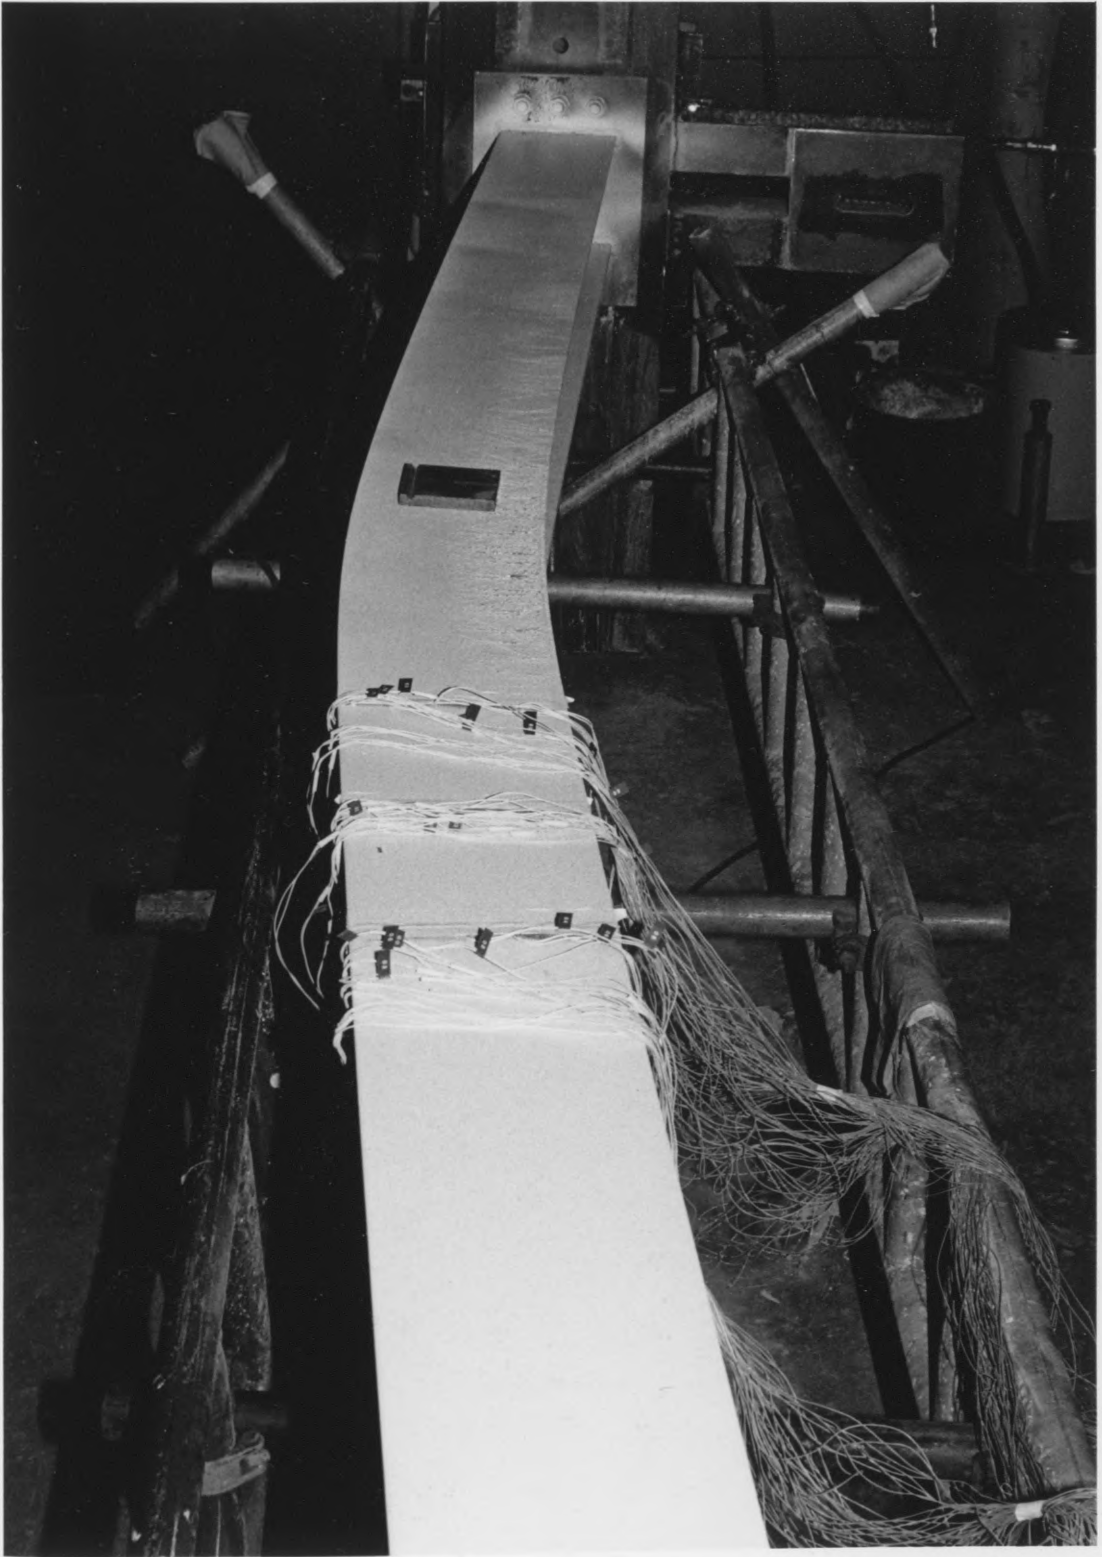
TYPICAL DEFLECTED SHAPE AT FAILURE
